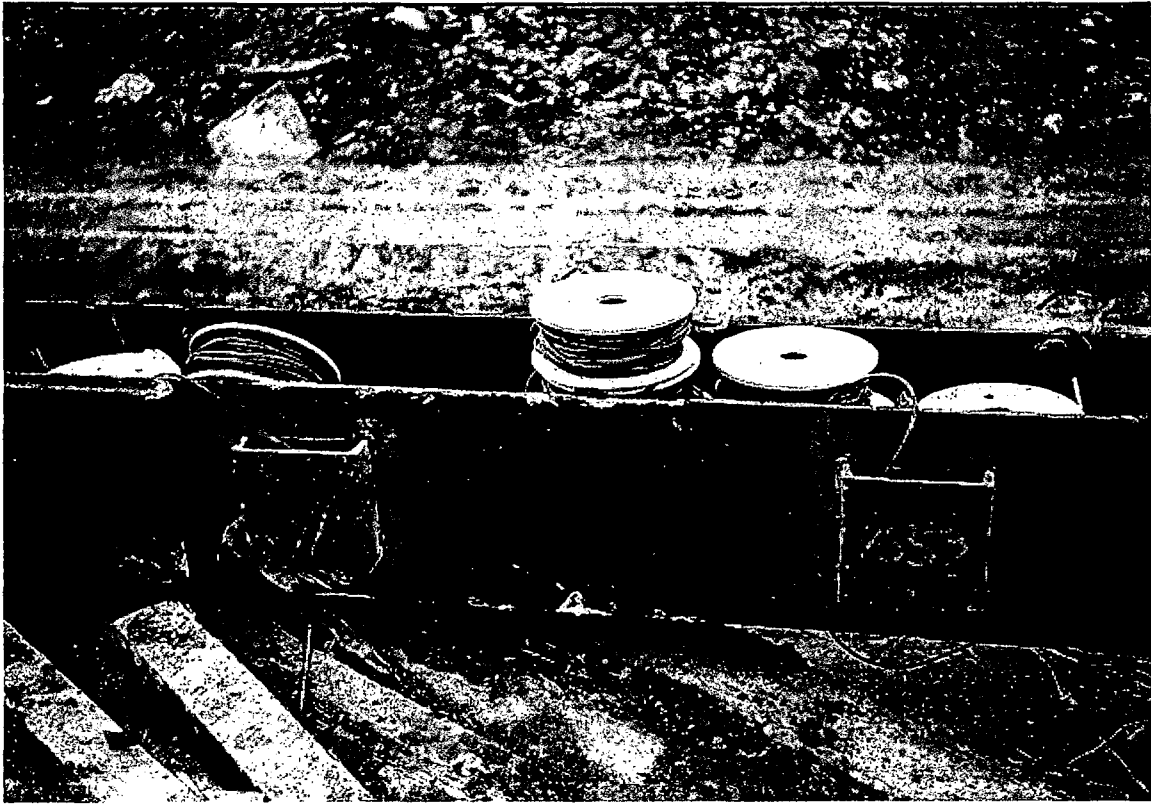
Protection C bracket been welded to protect the gage.
